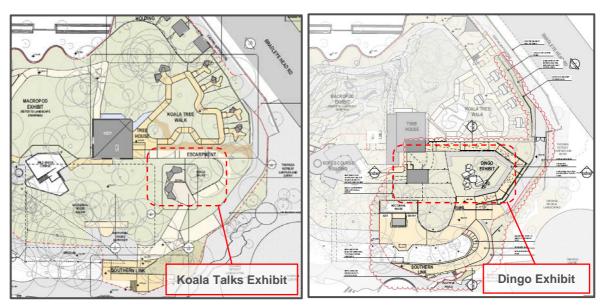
| Exhibit Layout: approved (left), proposed (right) (source: Applicant)
